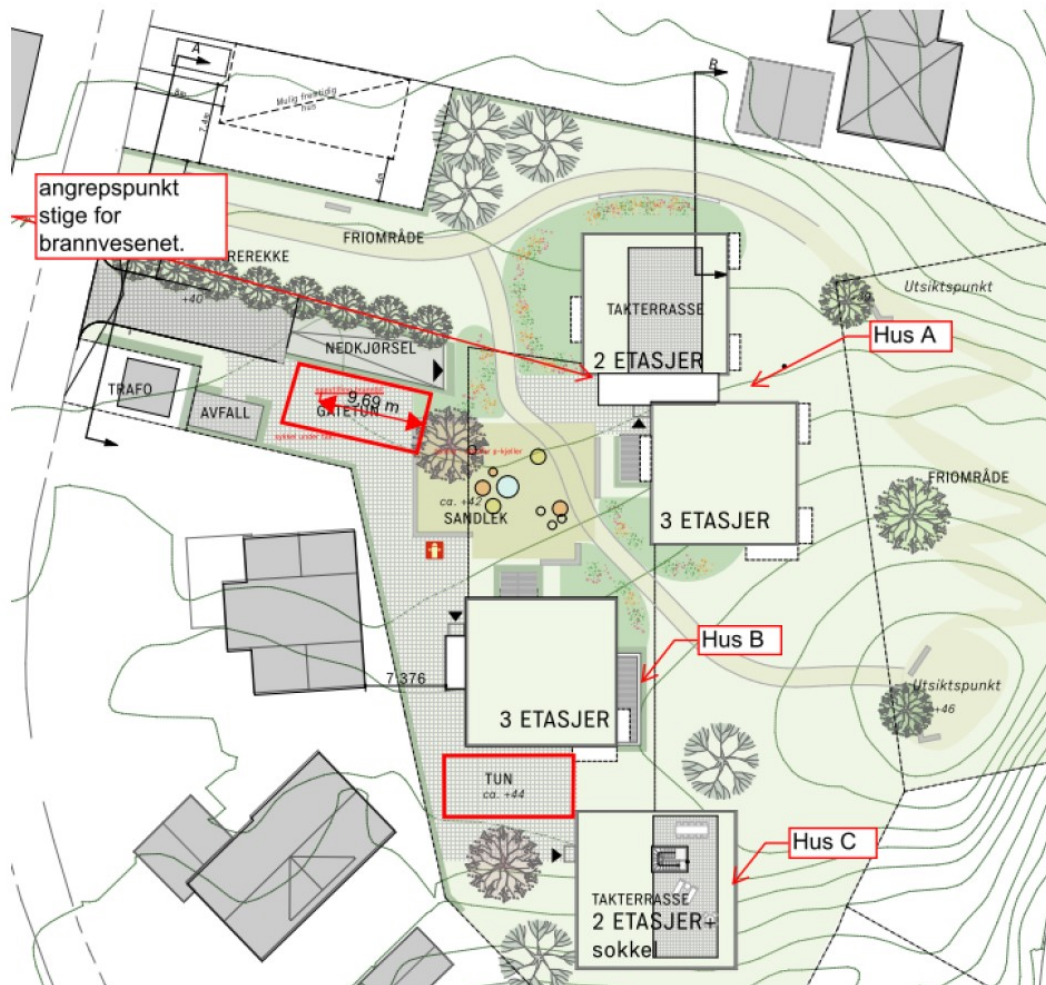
Site Plan (edited by fire engineers) to show the proposed location of fire trucks
